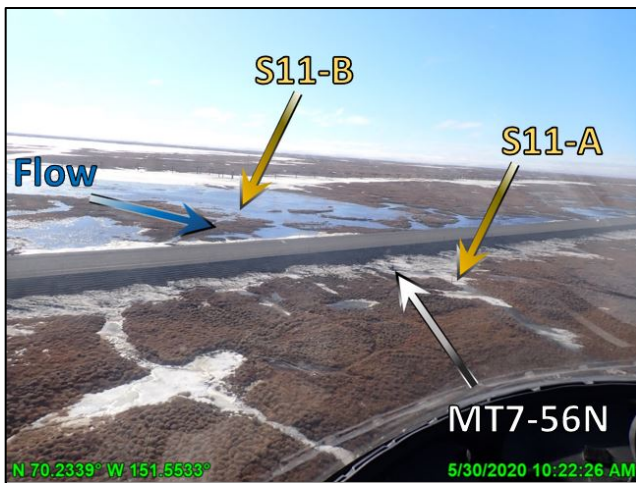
Meltwater behind blocked culvert MT7-56, looking south; May 30, 2020
